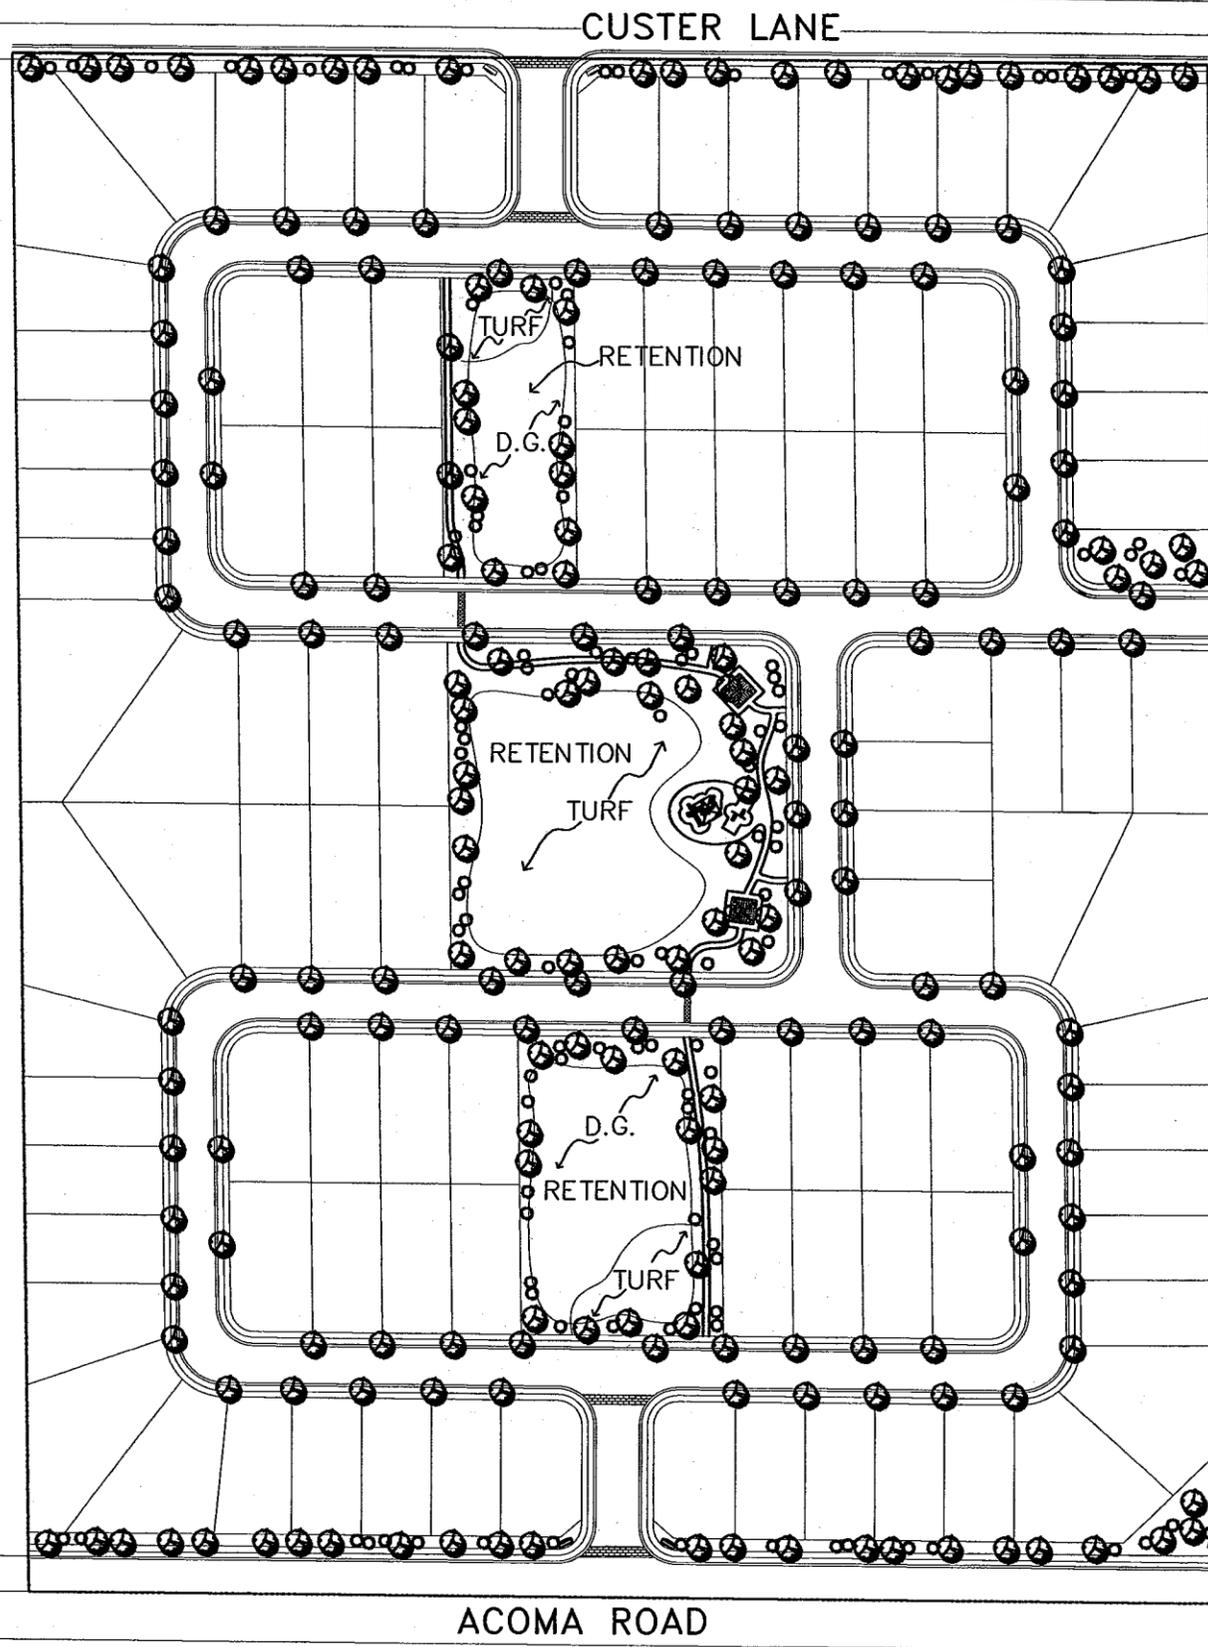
CONCEPTUAL LANDSCAPE & OPEN SPACE PLAN
